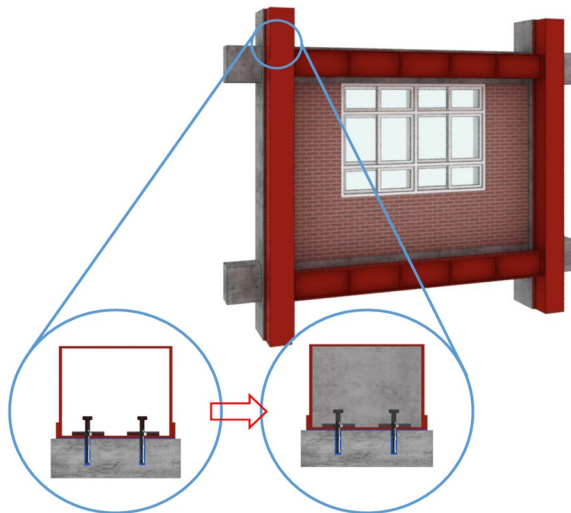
CFT (concrete filled steel tube) seismic reinforcement
